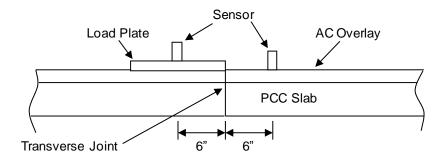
Joint Load Transfer Testing Sensor Spacing
